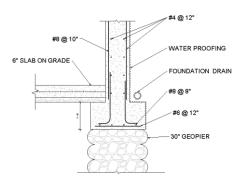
RETAINING WALL AND STRIP FOOTING DETAIL
